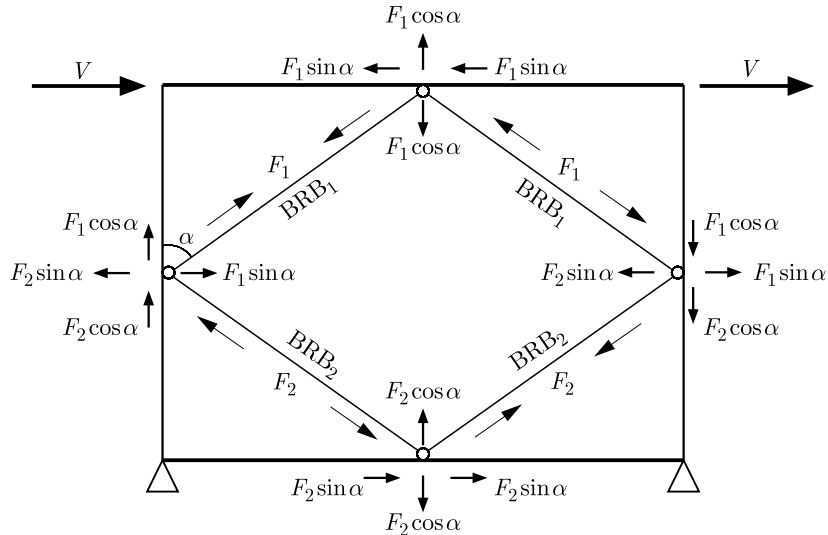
Equilibrium of internal forces structural model of DBRBF
